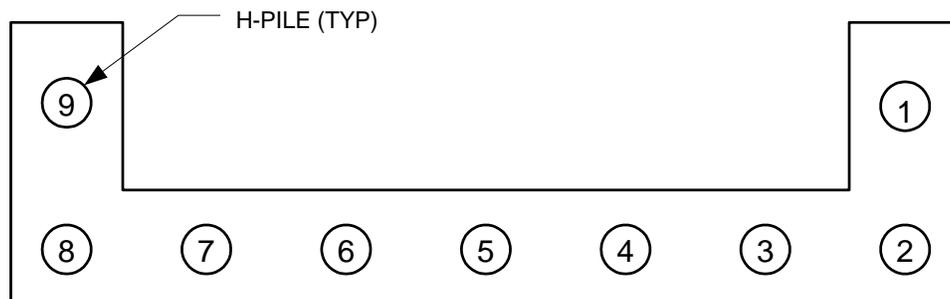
Track 1 Example 3: Pile arrangement at an abutment
